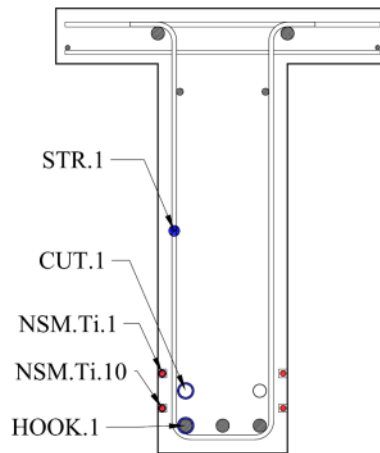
Typical titanium strengthened specimen cross section with labeled internal sensors
